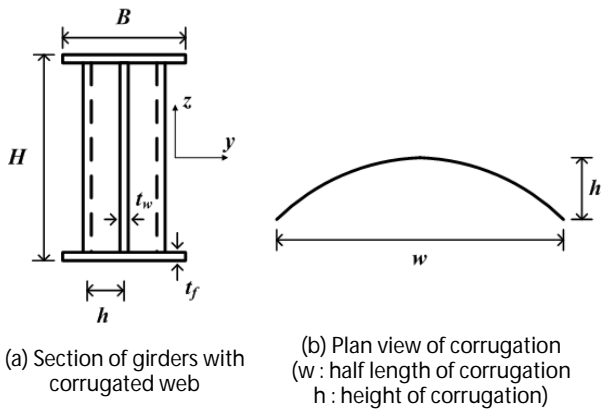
Section and geometric plan view of corrugated webs (for half cycle)
